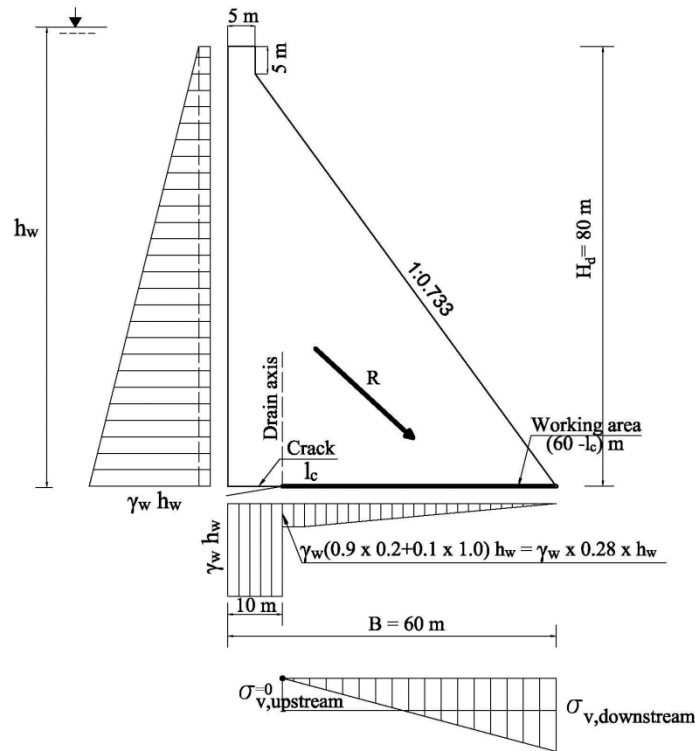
Loads acting in dam's profile and working area exemplification after crack development
